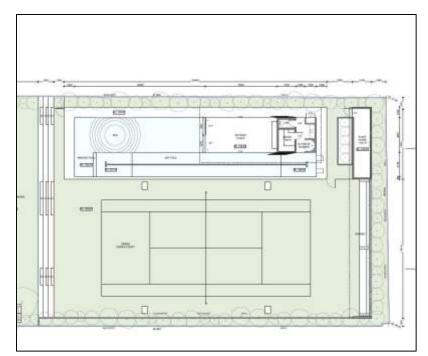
Floor Plan of New Ancillary Structures in the Rear Yard
